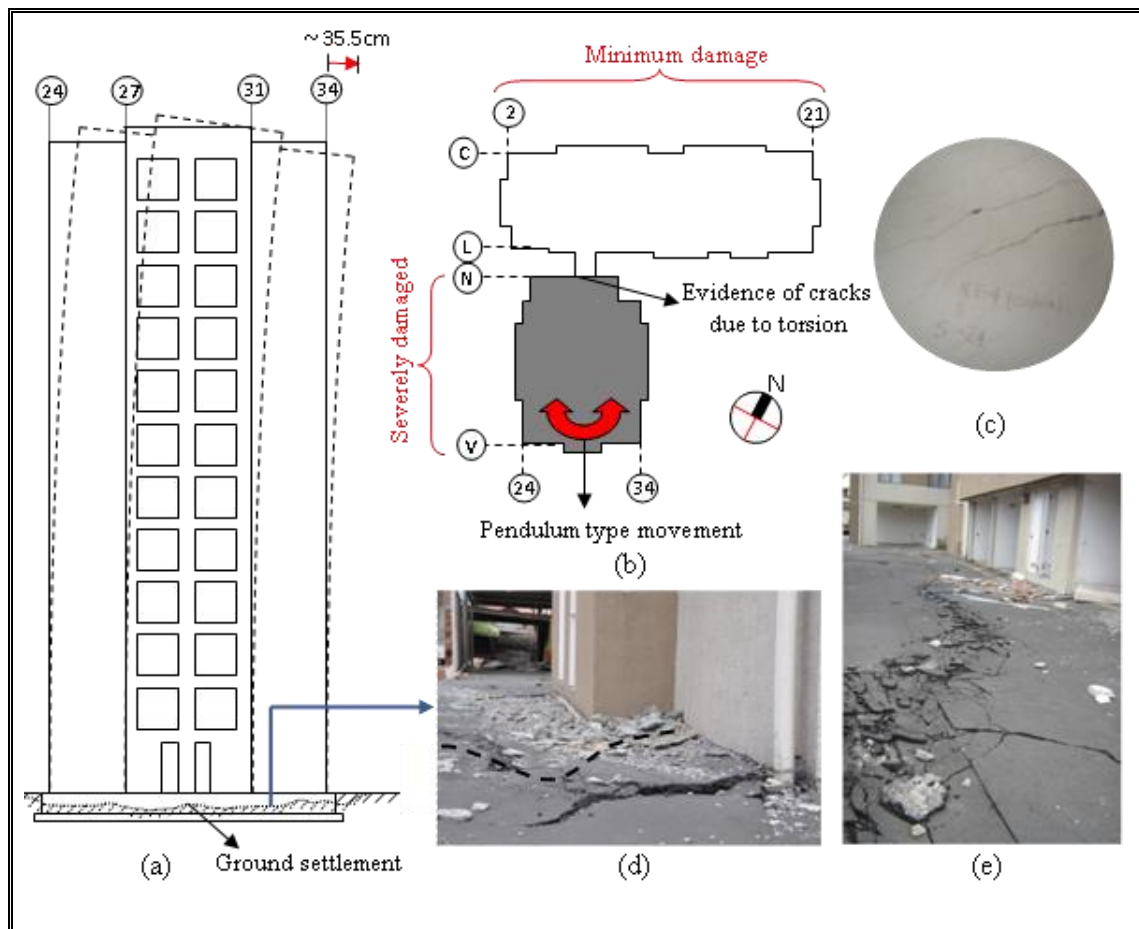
Building PR-6; (a) Schematic elevation V-W, (b) Story plan and damaged area, (c) Torsion in axis N, (d) Ground settlement near axis V, (e) Settlement in PR-6
